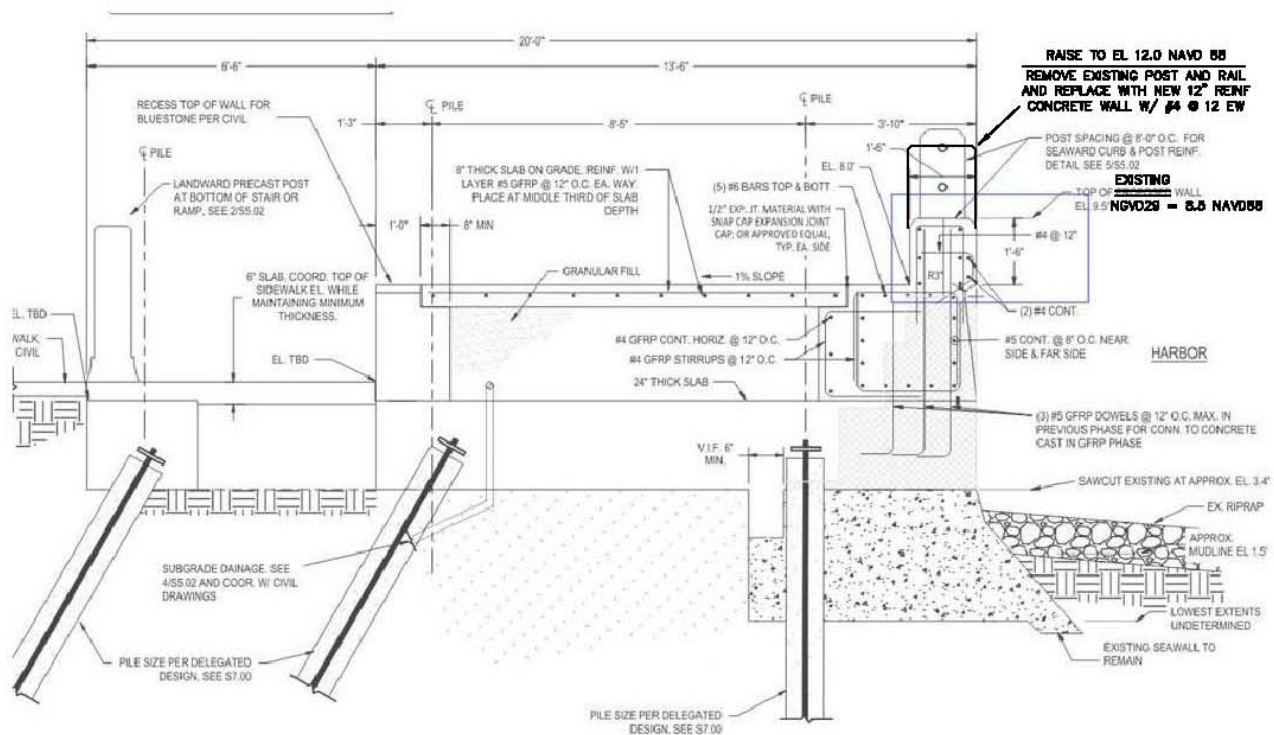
Typical section of Low Battery Wall Upgrade to EL 12.0 NAVD 88 flood protection
